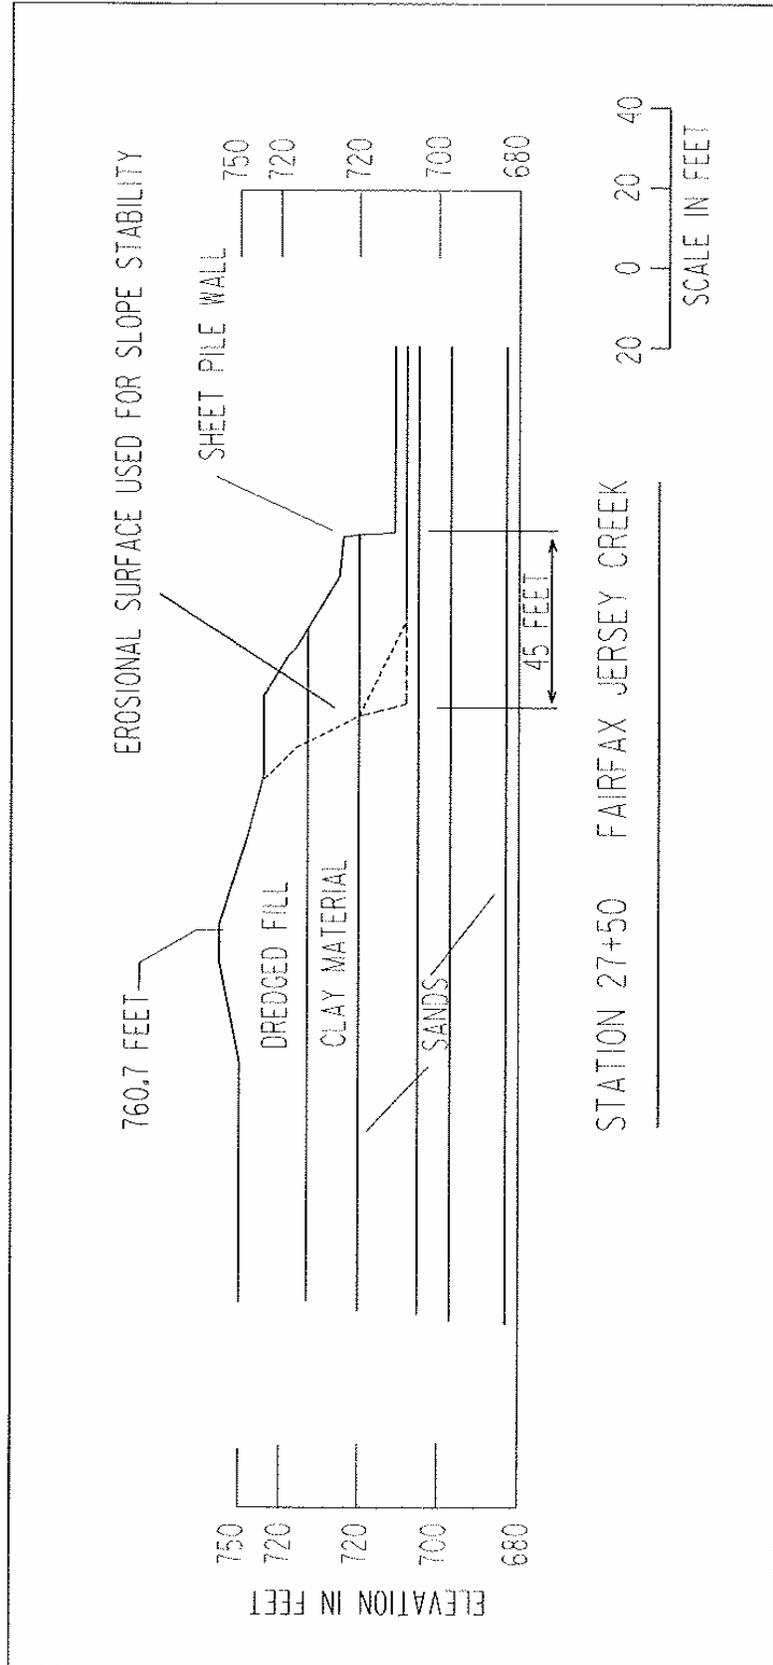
Modification to Existing Protection Typical Levee Sections and Wall Details
